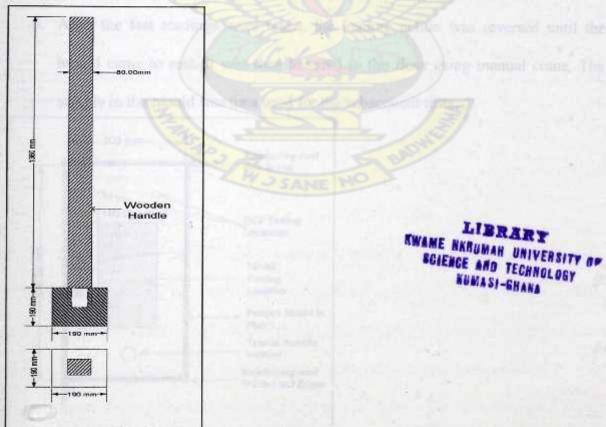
Wooden Rammer Used for the Model Compaction in Section and Plan
